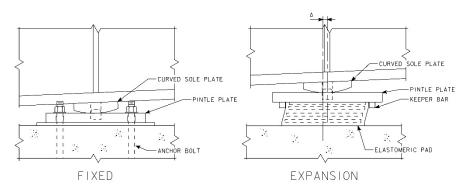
Pintle Plate & Pintle Plate with Elastomeric Pad Bearings
